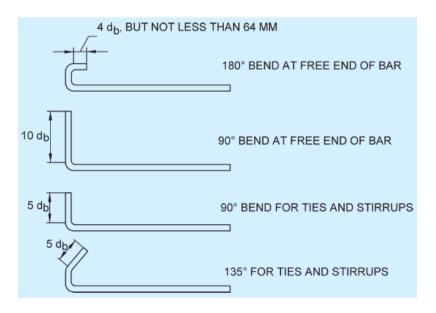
STANDARD HOOK 4D_B, BUT NOT LESS THAN 64 MM
